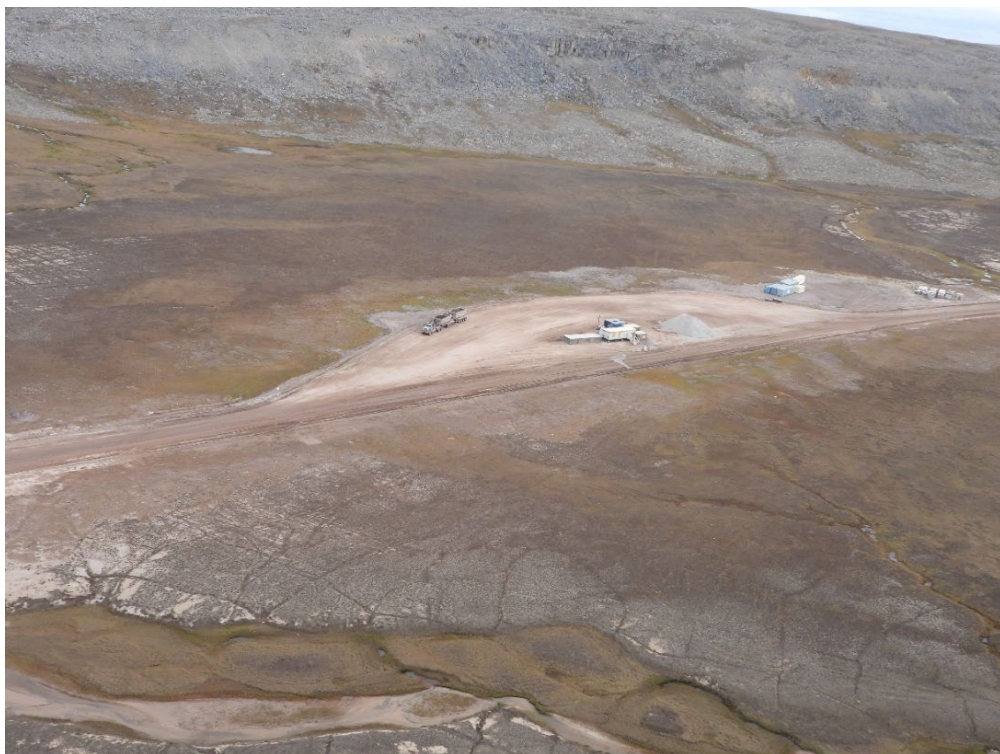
Aerial of loaded Ore Haul Truck Parked at KM60 Rest Stop – September 2023
